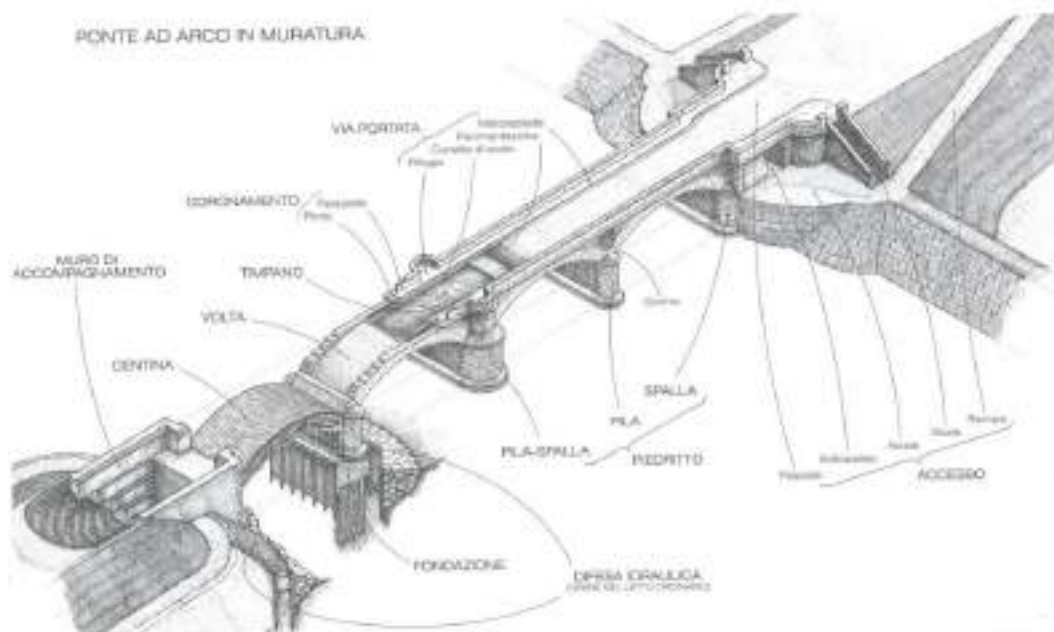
Typical configuration of modern masonry arch bridge (Torre, 2003).
